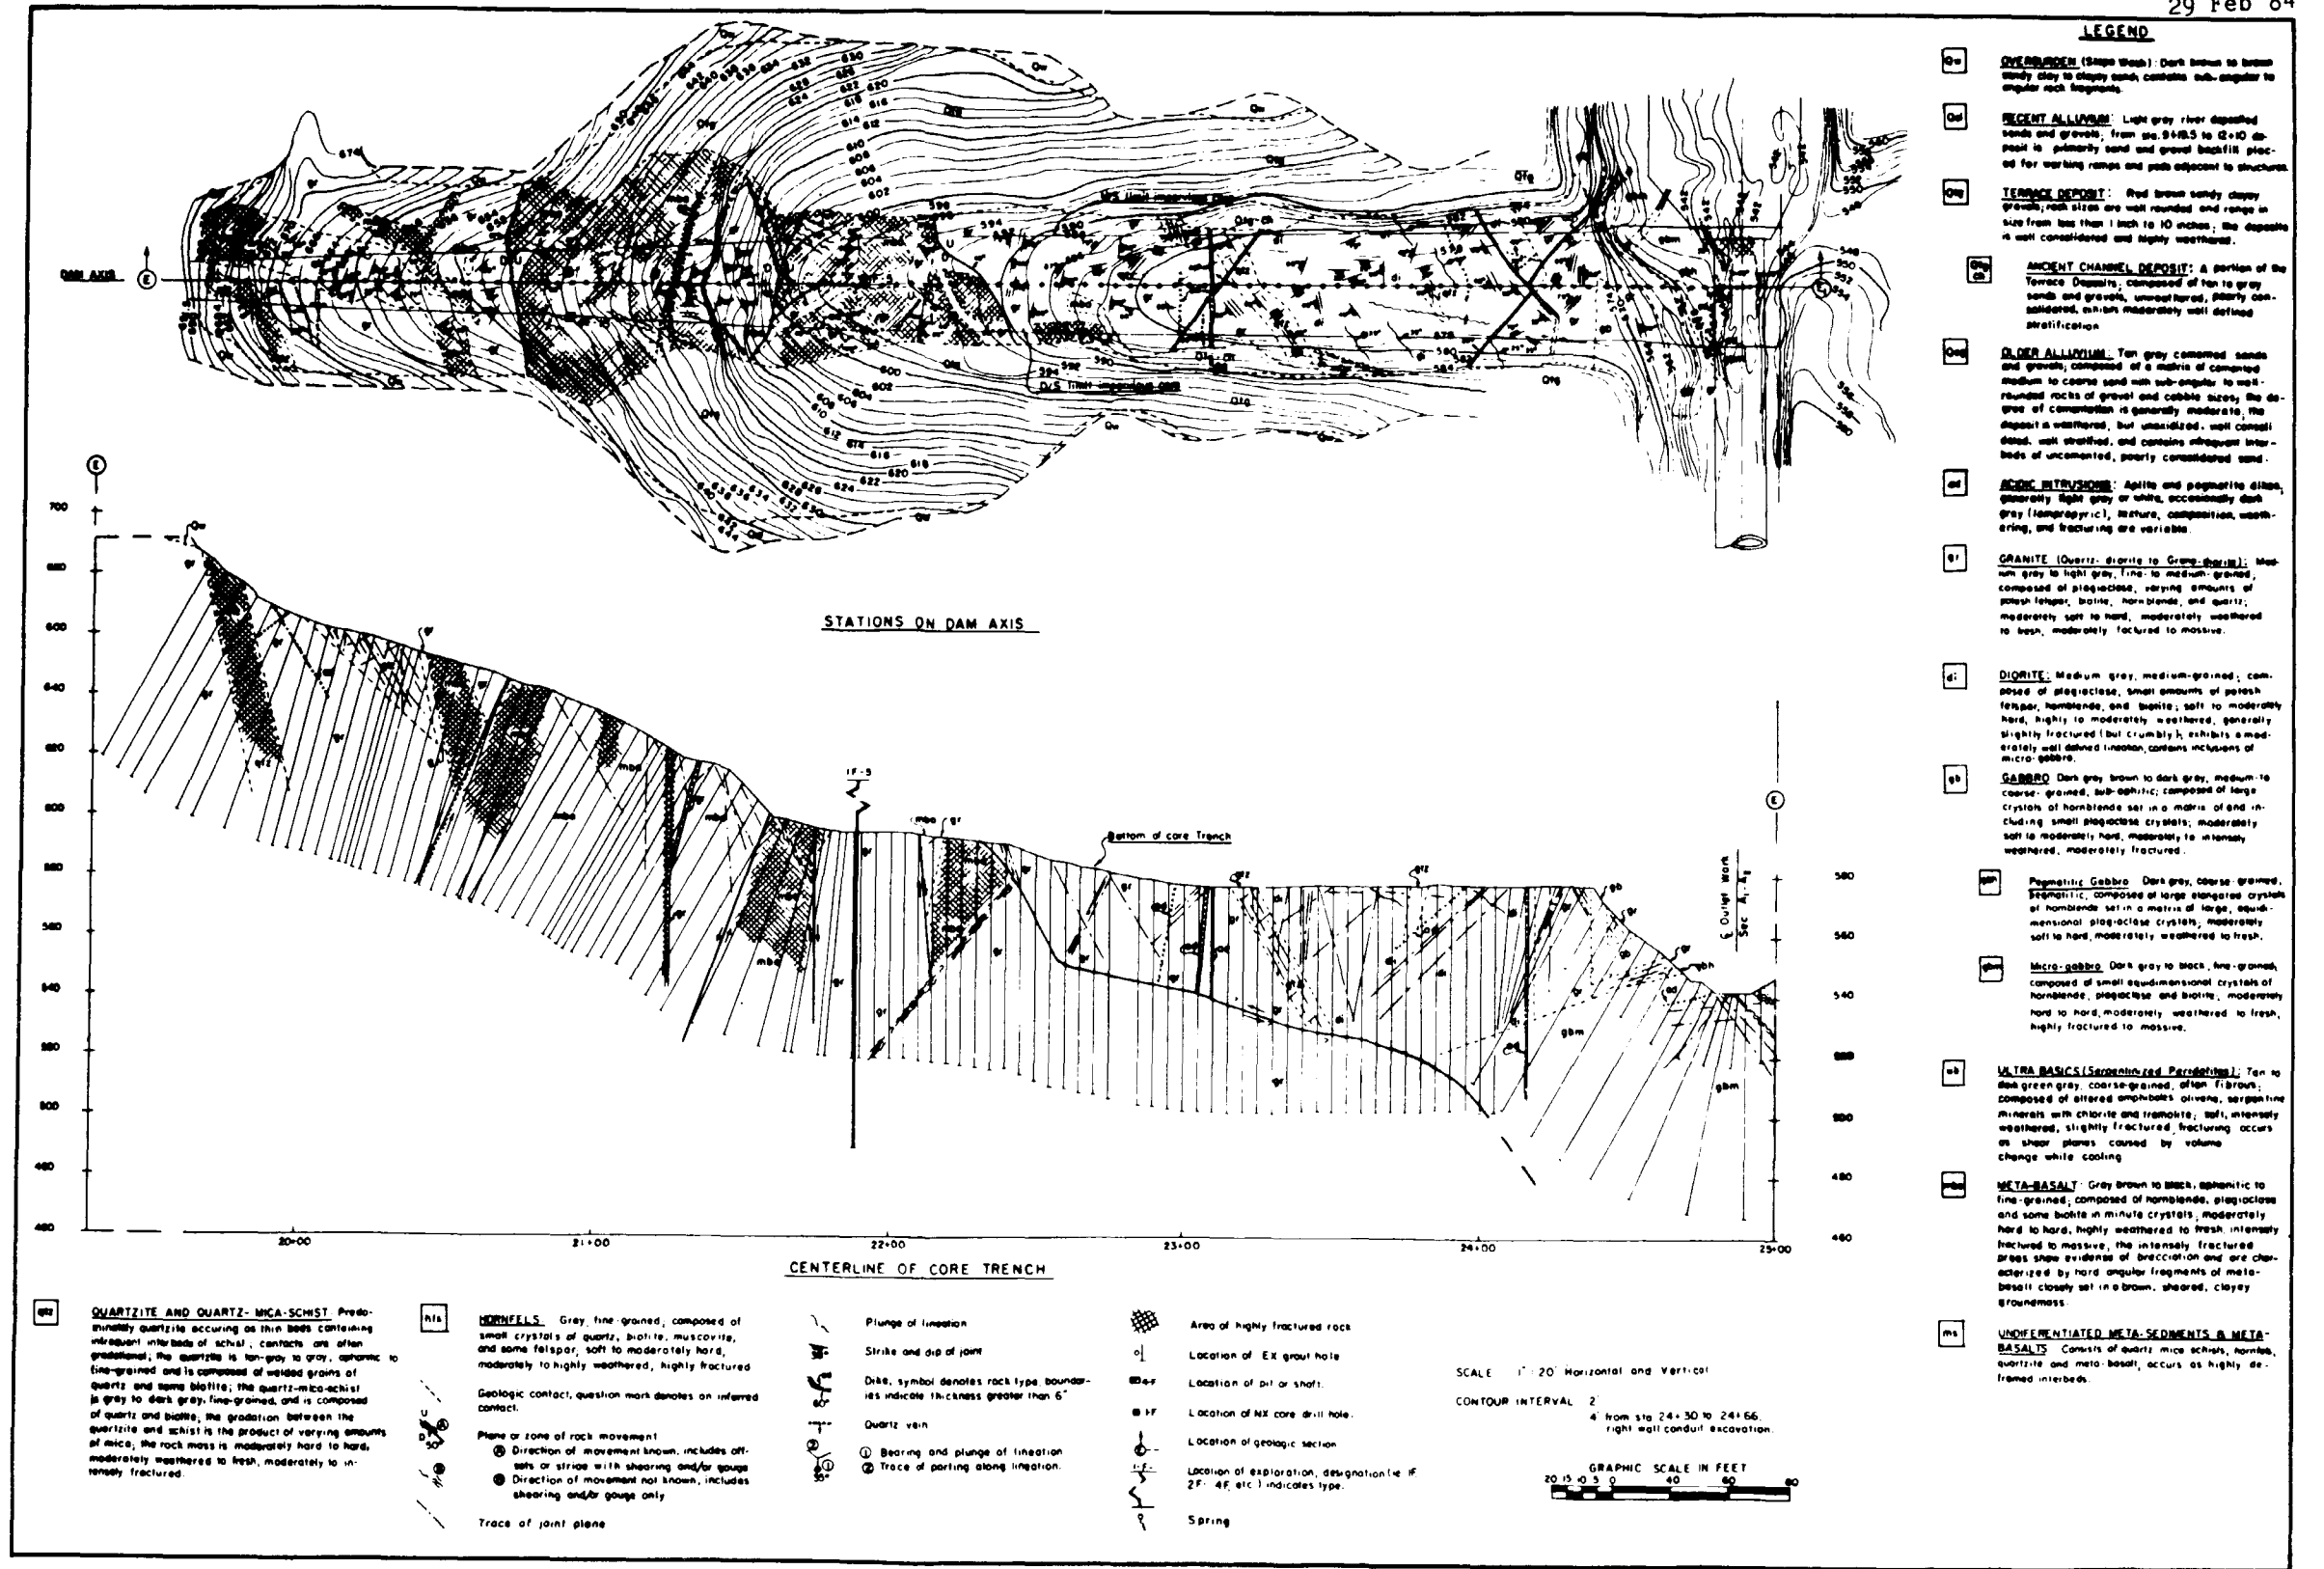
Foundation map for earth dam impervious core on metavolcanic and igneous rocks
